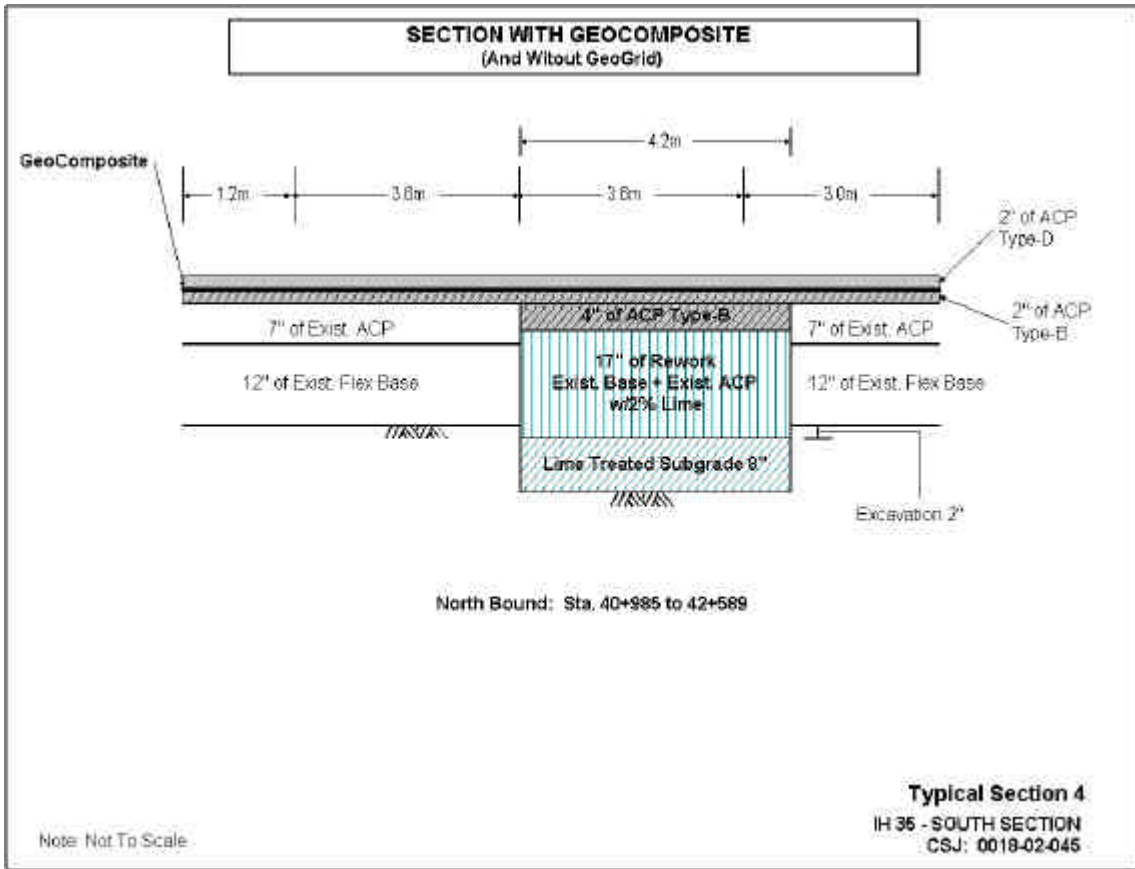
Proposed South Typical Section 4 of IH 35 in Laredo District.
